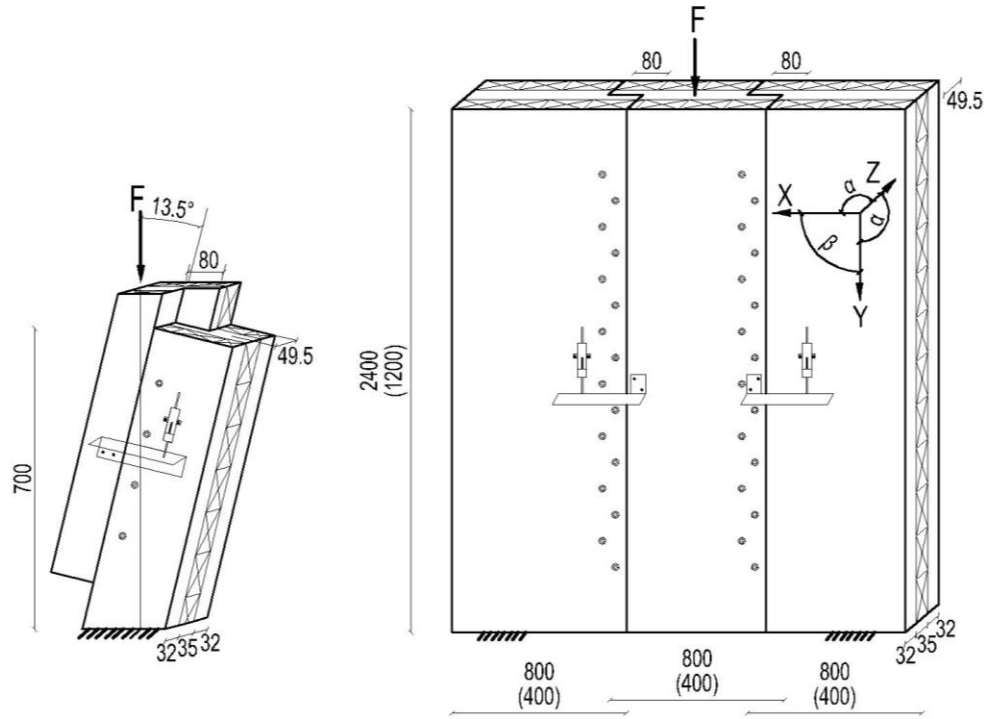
Test specimen layout: a) small specimens with one shear plane, and b) specimens with two shear planes (not to scale) (all measurements are in mm)
